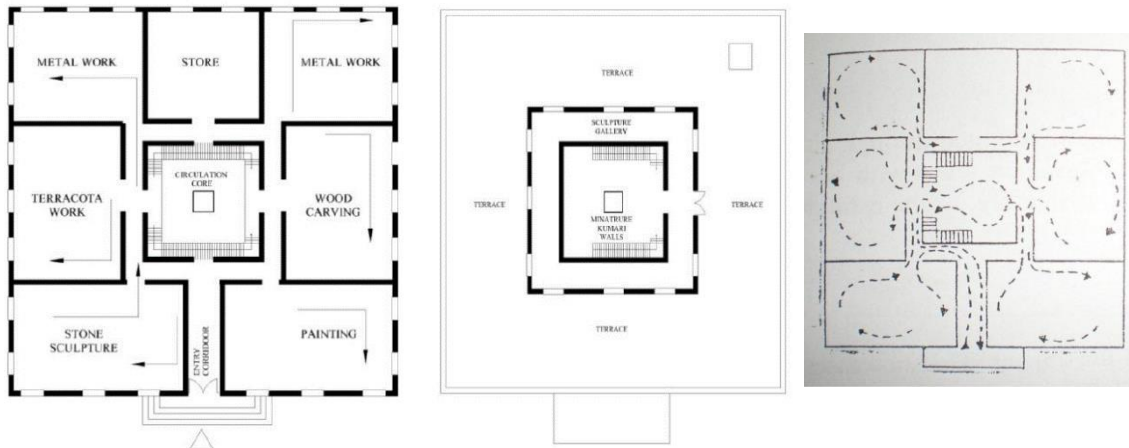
Floor Plans of Juddha Jatiya Kalashala
